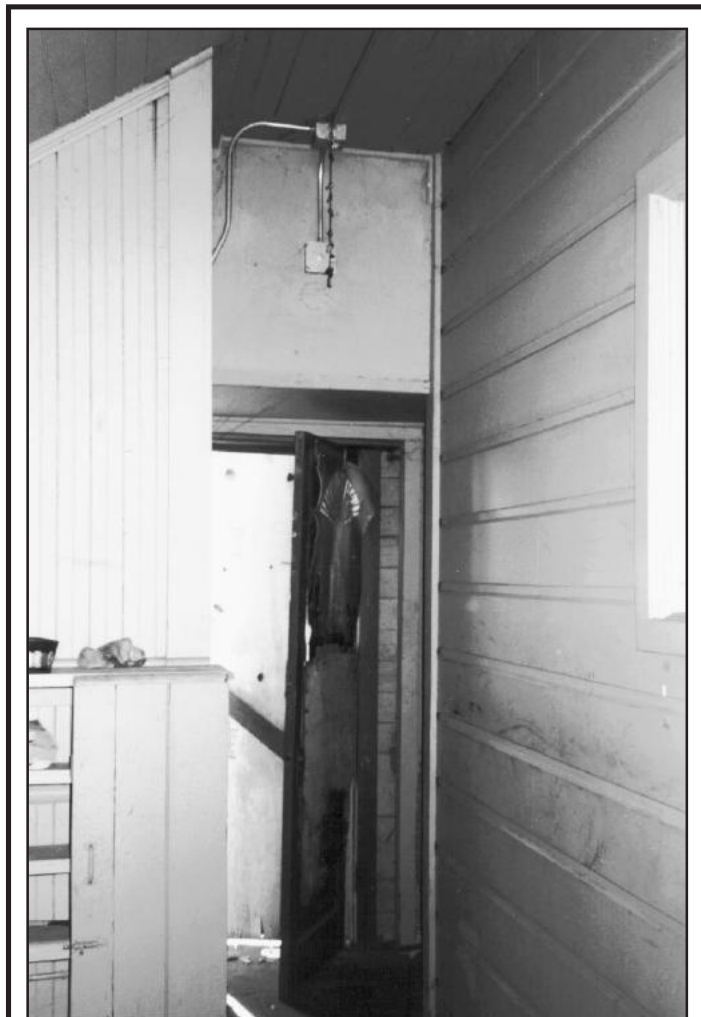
ADDITIONS SHOWN IN CEILINGS AND WALL MATERIALS, DINING ROOM OF 1825 SHOREY STREET. To the right is the former exterior wall of an earlier addition. The new wall to the left shows expansion of the toilet room; the lowered ceiling at the back, a former rear porch. (Credit: Marta Gutman)
